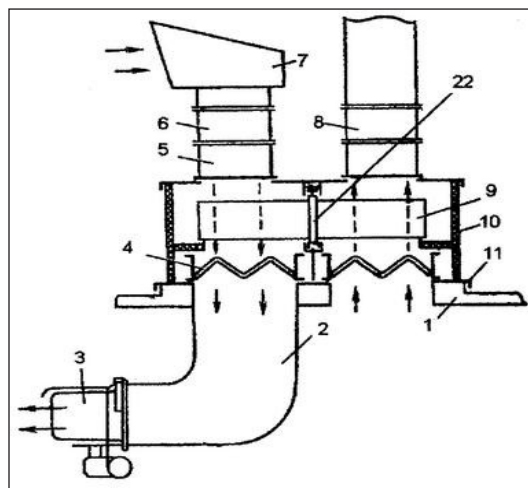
Supply and exhaust unit (patent No. 2282794)
